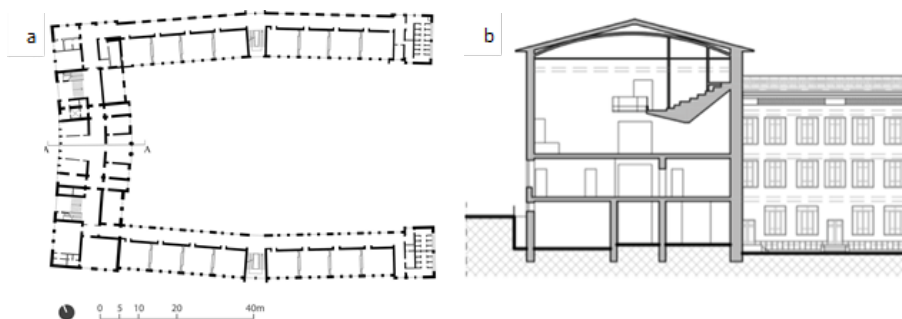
(a) layout of the ground floor; (b) section A-A.
